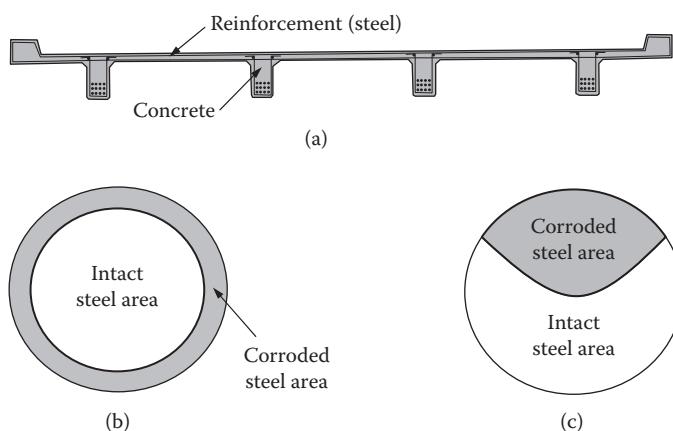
(a) Cross section of an RC bridge deck, (b) uniform corrosion, and (c) localized corrosion.
